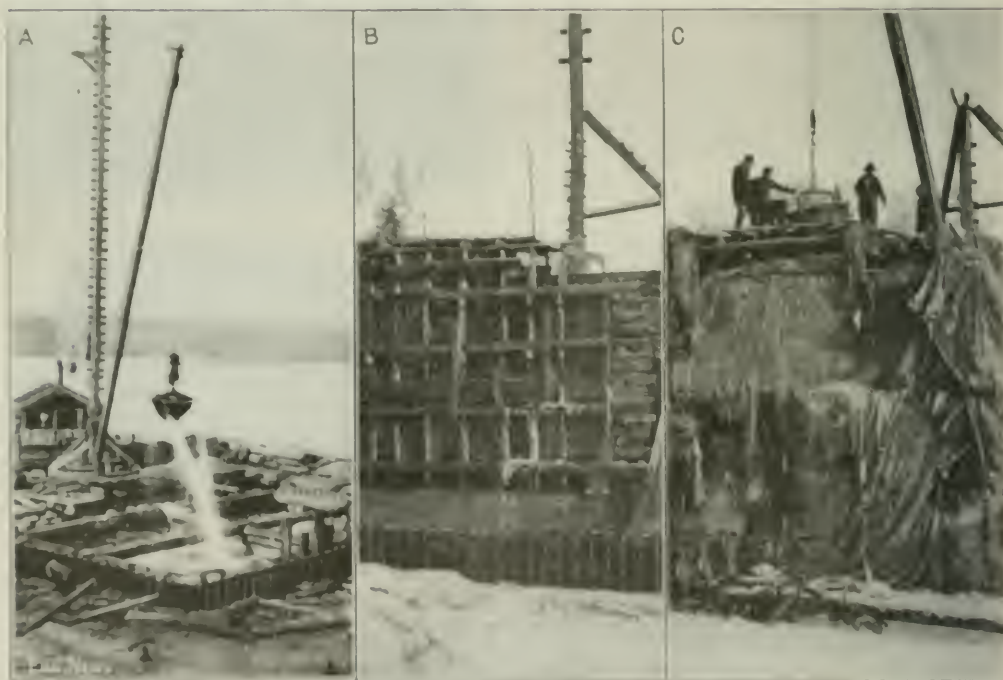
WORK ON THE PIER AT THE NORTH CONCRETE BRIDGE, FRANK RIVER, GRAVEL TRUSS, PASTER, KY.
